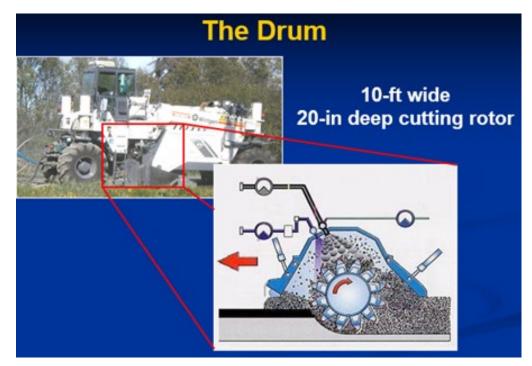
Reclaimer used for Reconditioning, Emulsion and Foam Stabilization
